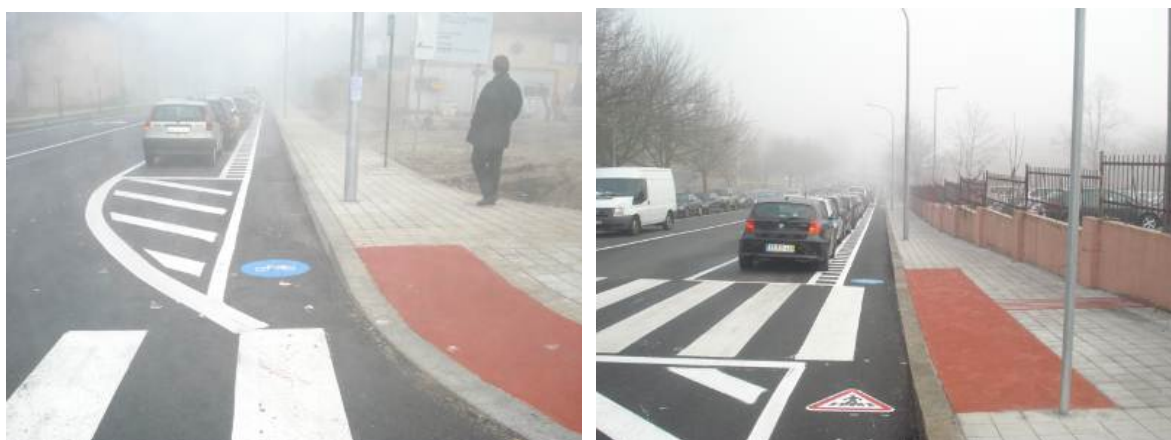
Roundabout on Dr. António Bernardino de Almeida with Conde d'Avranches intersection (after construction)
